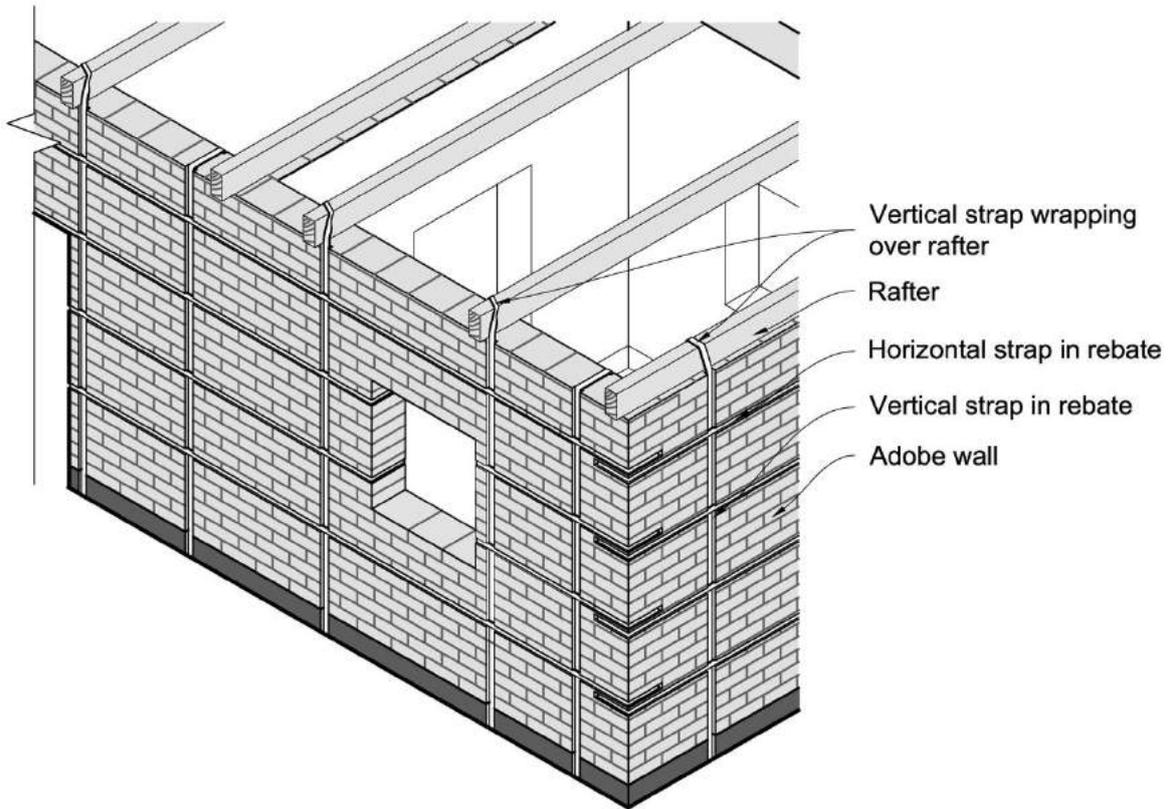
Vertical and horizontal straps have been installed. Note how horizontal straps wrap around walls and pass through walls at right angles in order to form a continuous band.
